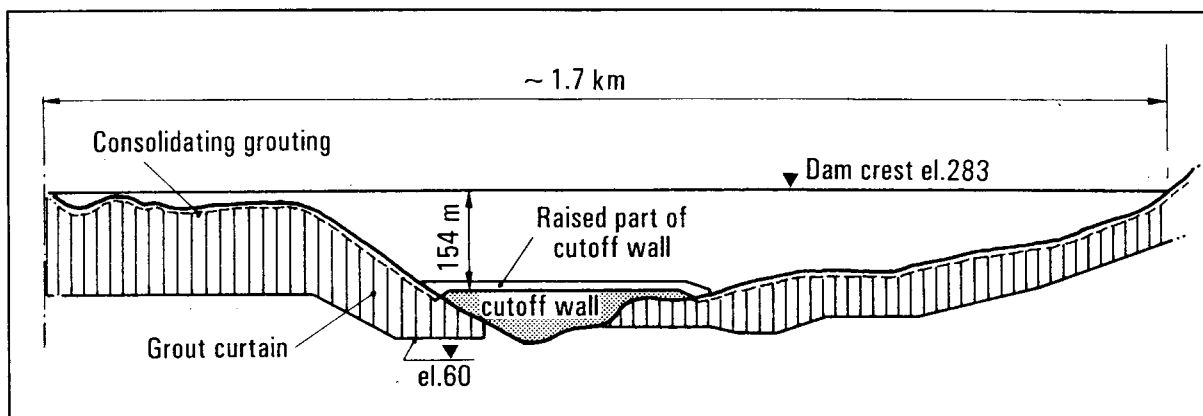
Longitudinal section along dam axis showing grout curtain and diaphragm wall (Godde, 1998)
